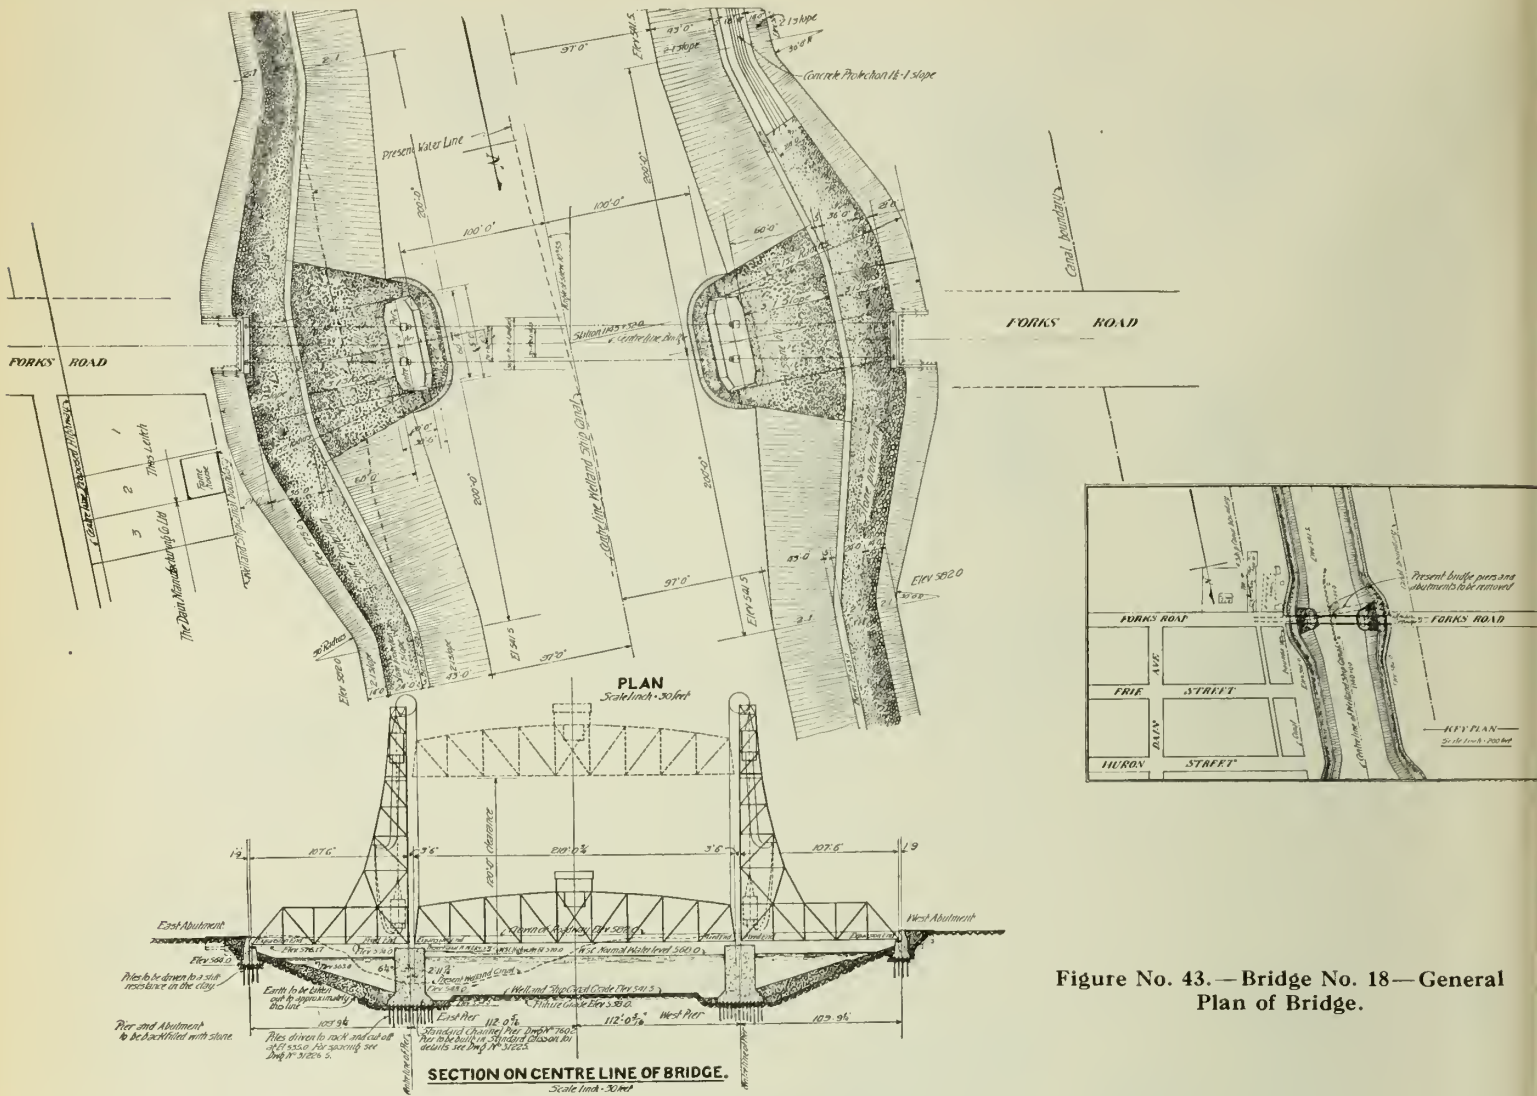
Bridge No. 18— General Plan of Bridge.
